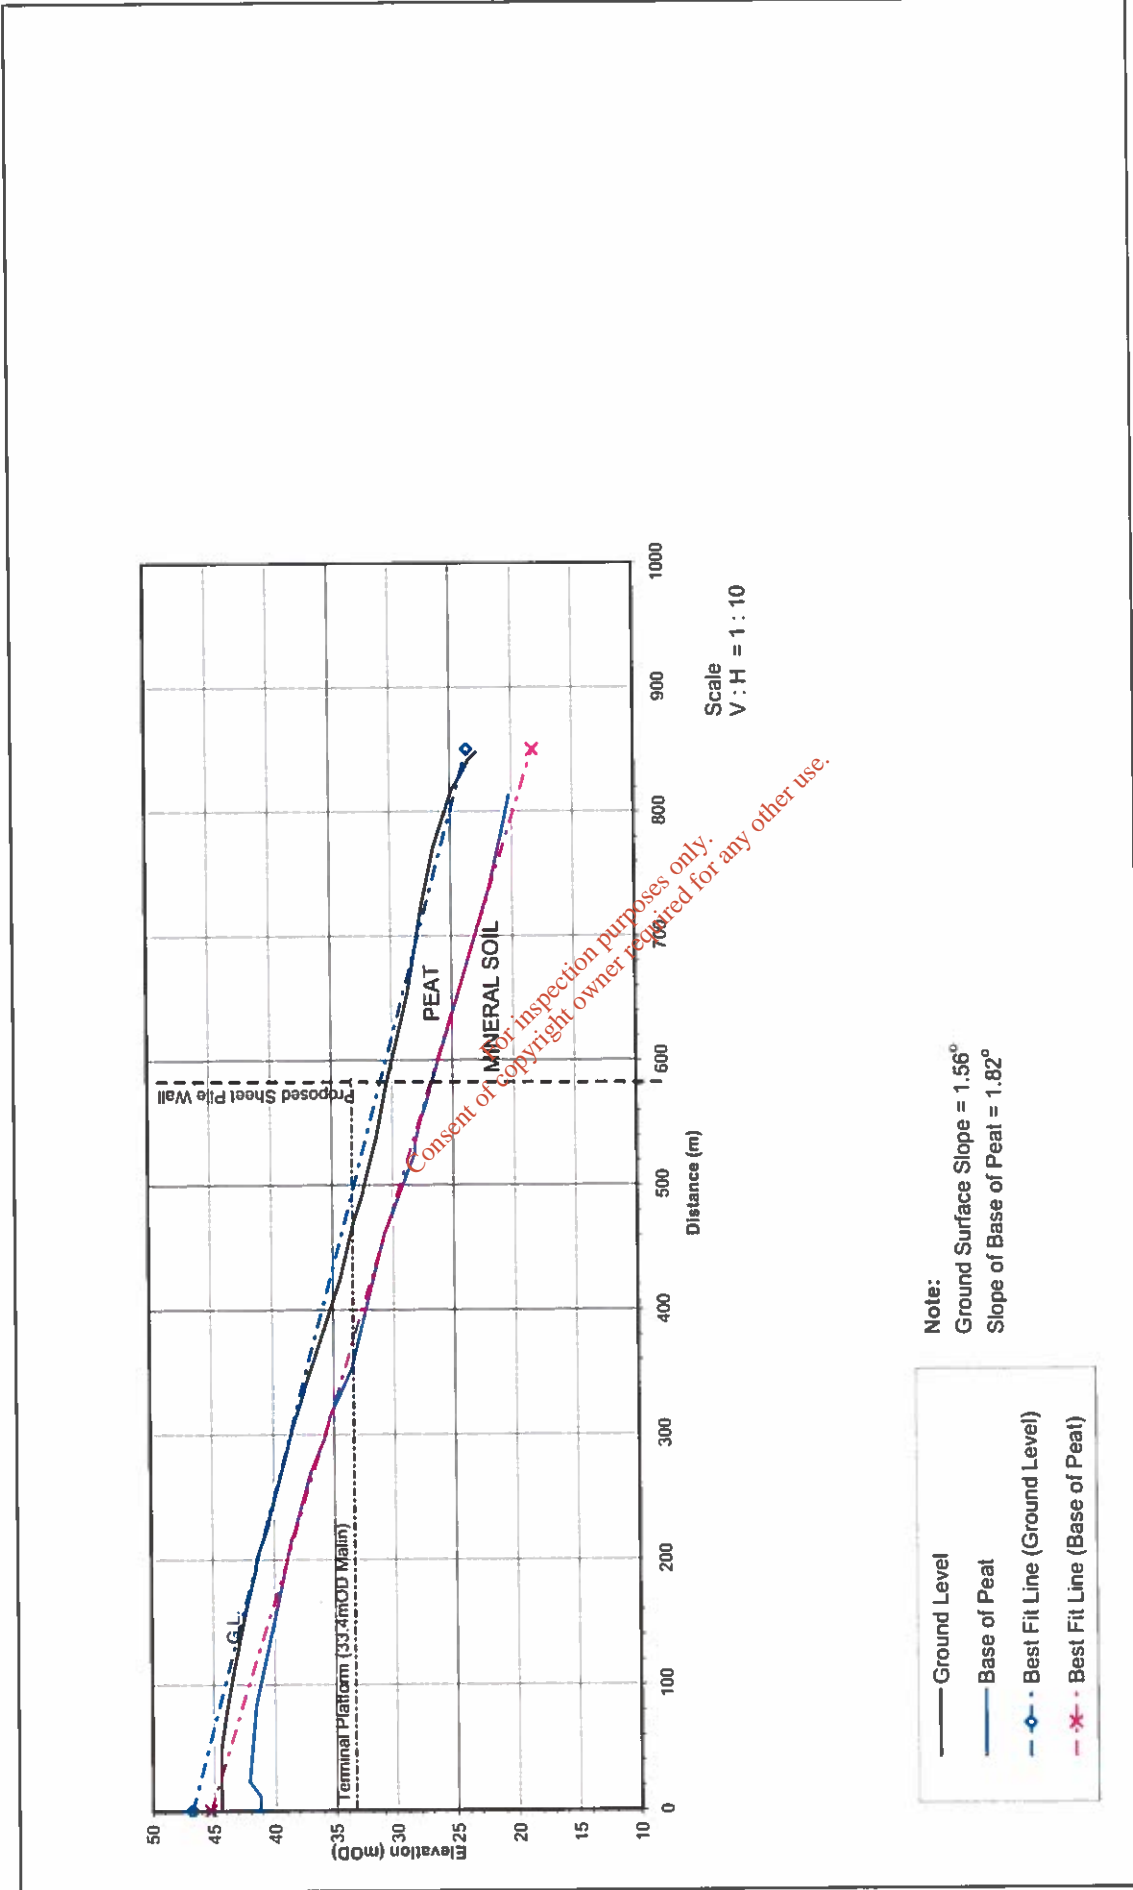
Typical Cross-section along Central Area (Cross-section 2)
